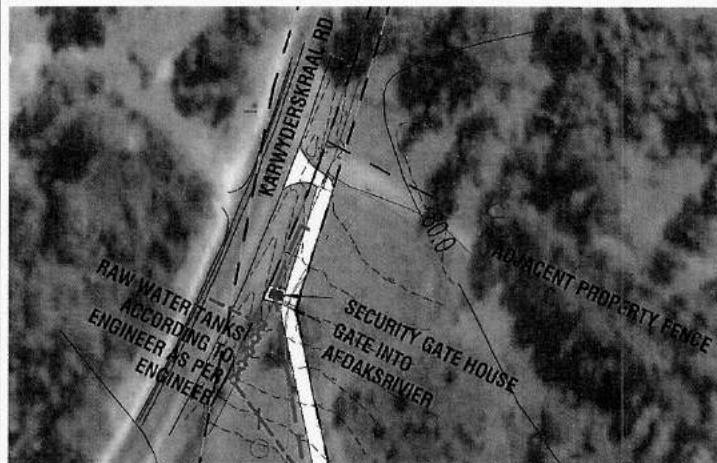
Access Position and Security Gatehouse and Entrance Gate Position to Afdakrivier
